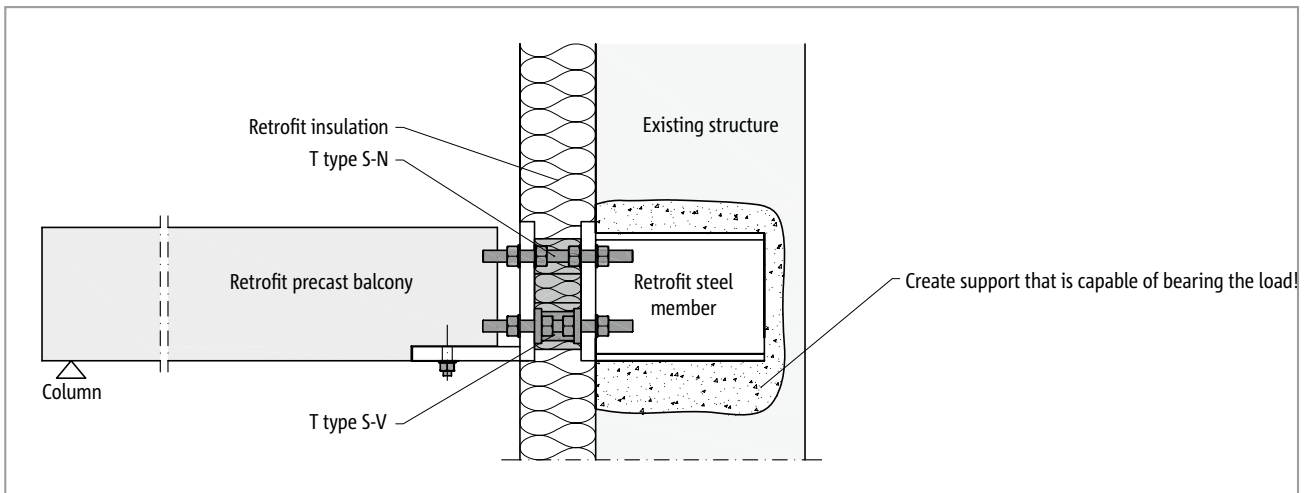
Schöck Isokorb® T type S-N and T type S-V: Retrofitted supported precast balcony connected to retrofitted wall support
